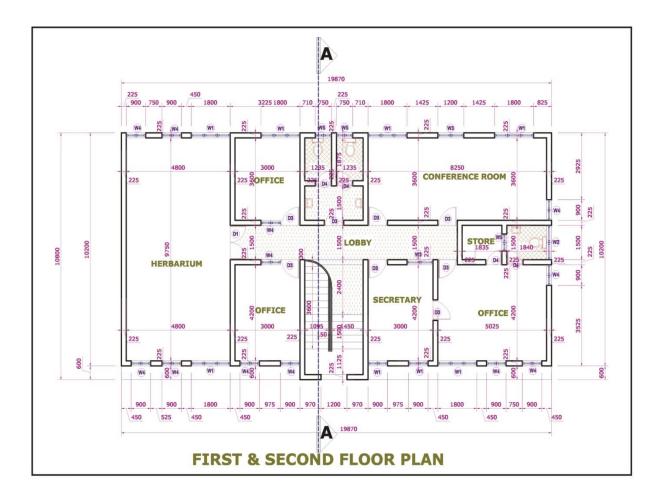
Prototype Botanical Garden Structure Office Building First and Second Floor Plans
